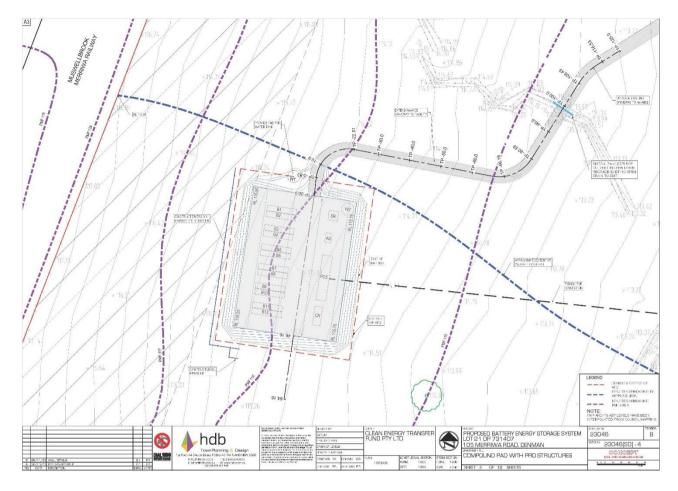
Proposed Site Plan and PMF Flood Levels (HDB, 2023).
